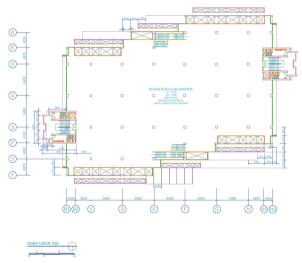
Floor plan of the reading hall of the Main Library Building of ITB
